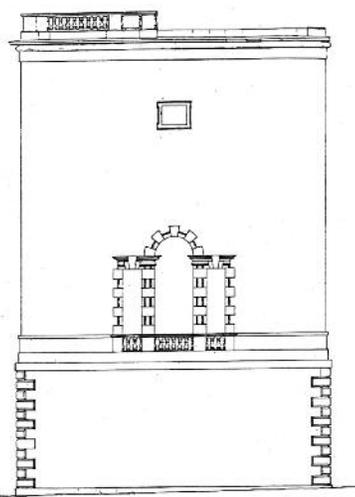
The Belvedere, south elevation, 1988. *Architecton.
